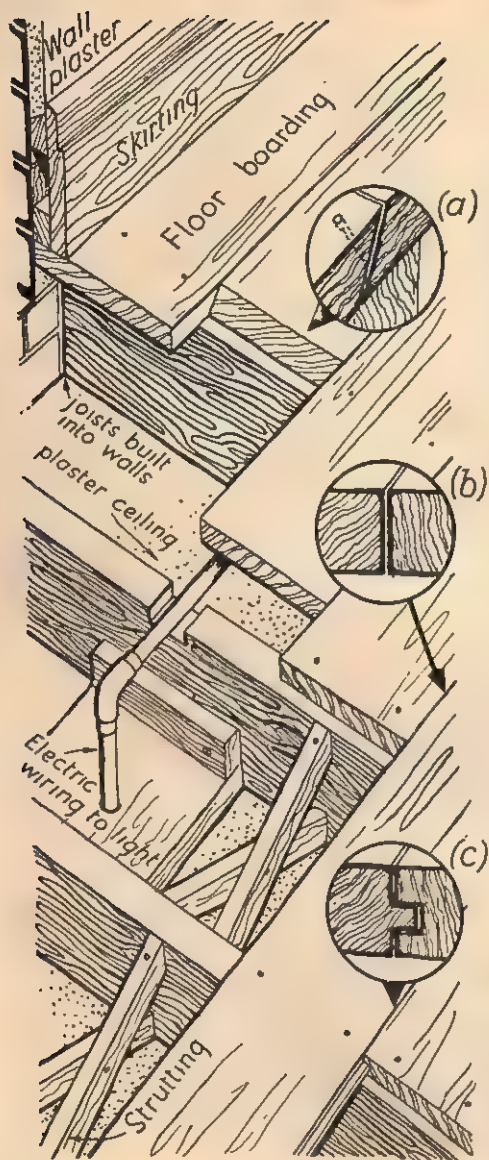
(a) How ends of floor-boards are joined. (b) Planks with plain edges, used for floors of hardwood. (c) Tongue and groove, always used for softwood floors.
